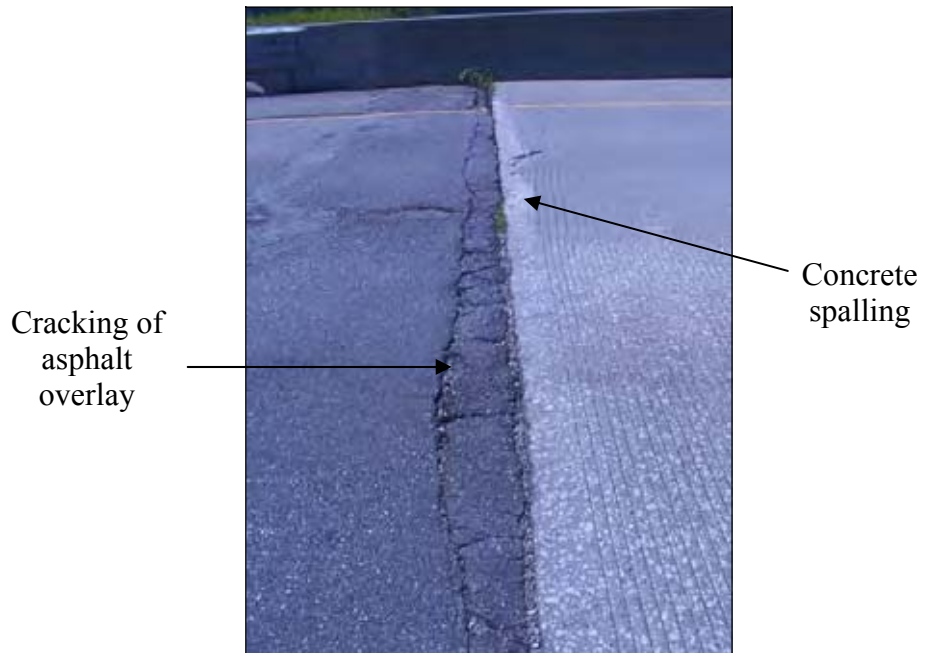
Concrete spalling and cracking of asphalt overlay at the expansion joint (South end of NBL)
